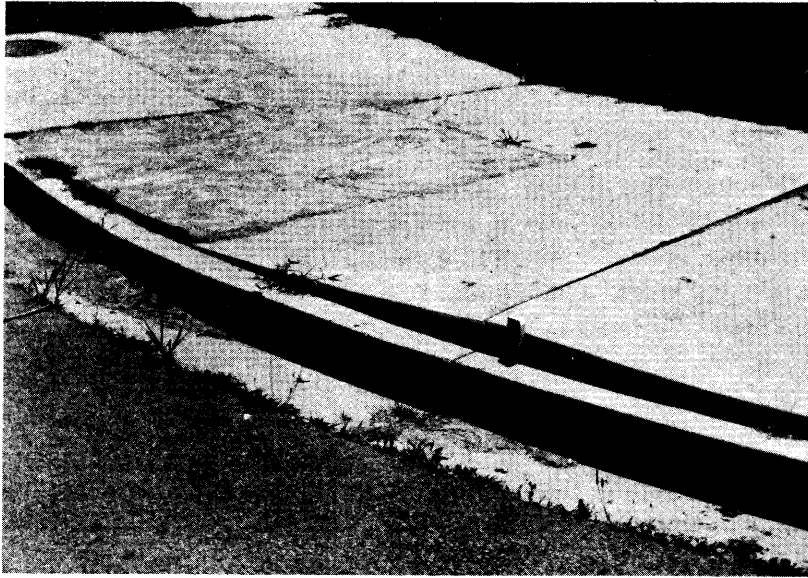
Typical fillet of sidewalk forced upward by undermining upgrade.
